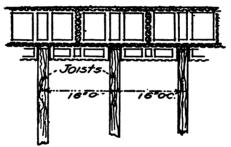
Plan of Joists Framed Into Hollow Tile Wall. Two Sets of Tile Are Used, as Shown
